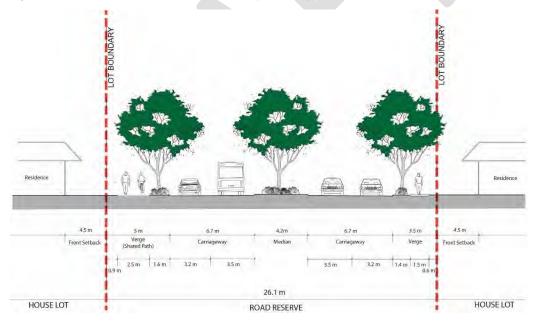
Dransfield Drive Extension Collector Road (Long Term)
